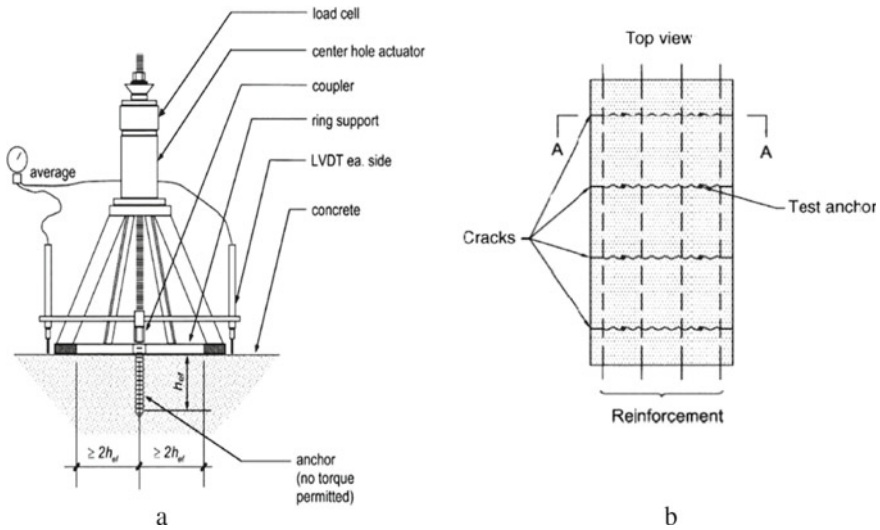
a Example of unconfined tension test setup for adhesive anchors, and b cracked concrete slab for testing [21]
